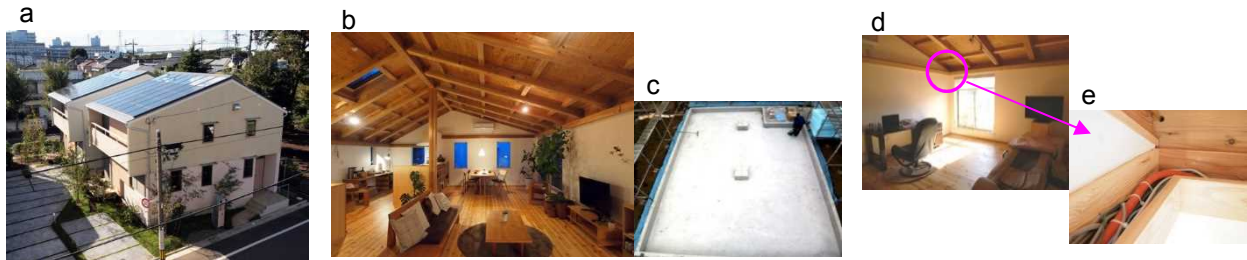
Photos of the ST Fuchu house (a) out-side of C-type house; (b) living room of B2-type house; (c) ground slab and foundation wall; (d) wiring space in bedroom; (e) detail of wiring space
